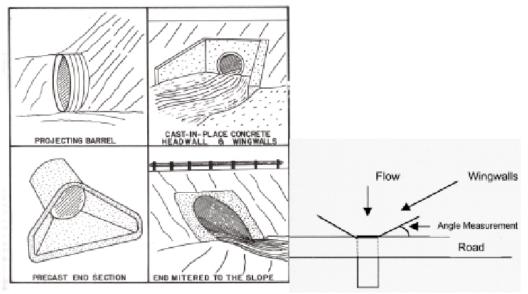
(from Normann et al 2001). Inlet type examples (clockwise from top left): projecting, headwall and wingwall, mitered and metal or cement end section. Wingwall measurement is illustrated below.
